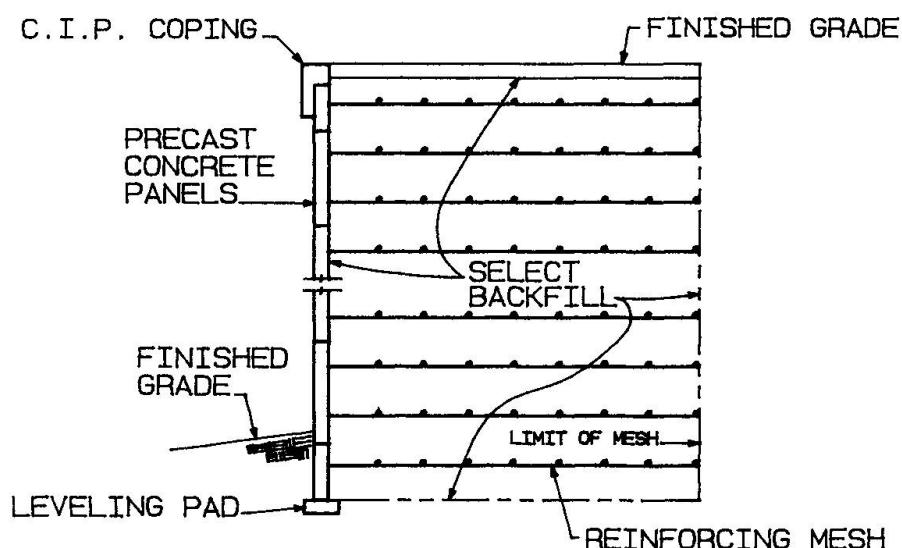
TYPICAL SECTION THROUGH R.E. WALL
